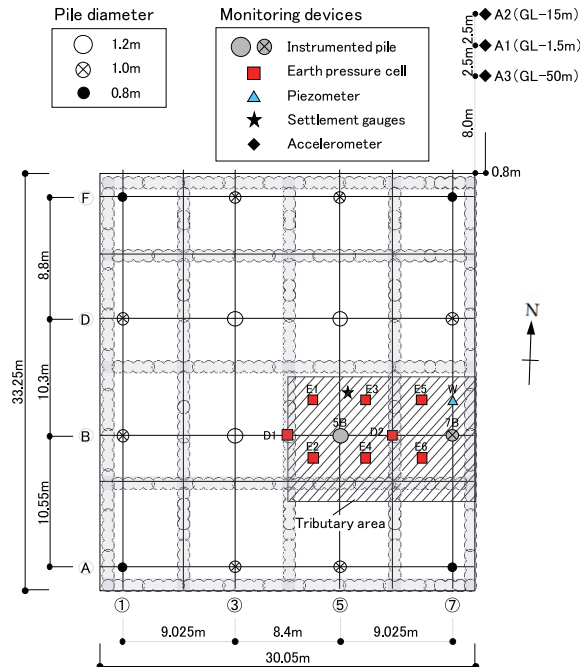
Layout of piles and grid-form deep cement mixing walls with locations of monitoring devices
